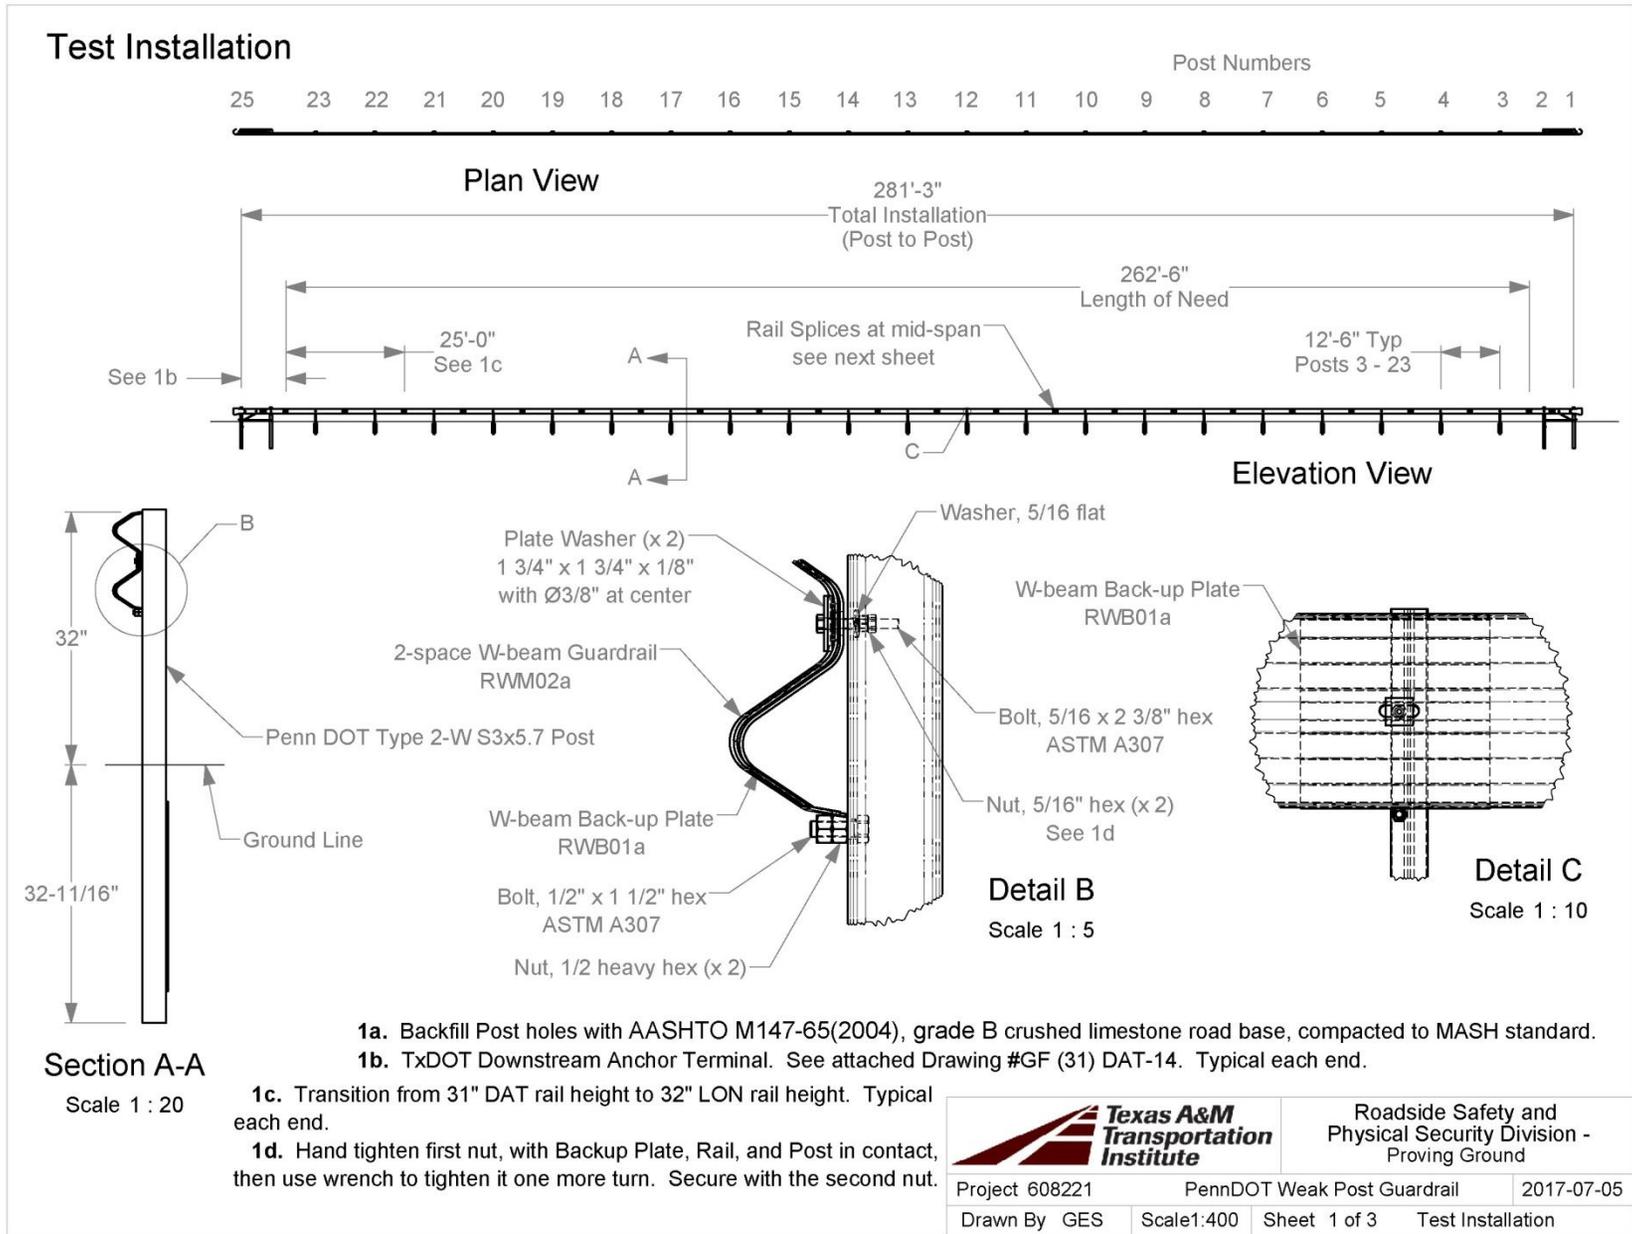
presents overall information on the G2 weak post W-beam guardrail system, and Figure 2.2 provides photographs of the installation. Appendix A provides further details of the G2 weak post W-beam guardrail system.
